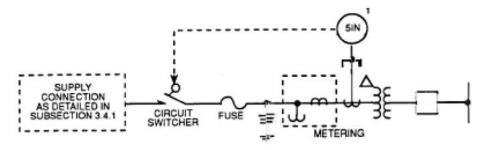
Primary Fused Installation With Circuit Switcher Subsection 3.4.3
